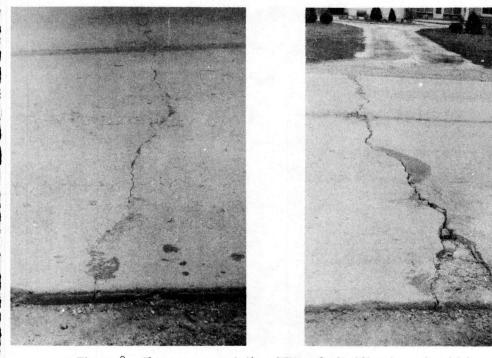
These represent the types of significant cracks which developed in the heavy reinforced sections (Designs 1, 2 and 9). The left shows the more normal condition of an old crack which is still held tight by the reinforcement while the other is an extreme example of one of the few cracks where the steel has also failed and deterioration of the concrete has advanced. over the 23 years, or that other factors have become more important to the performance of this pavement than variation in the amount of traffic. Thus, in comparing the efficiency of the various designs, the total length of a single lane pavement was considered.
